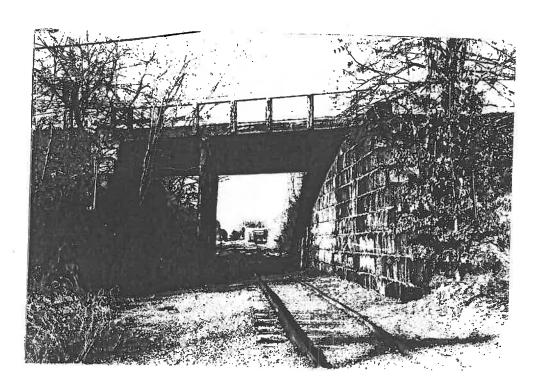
description: Wood stringer bridge carrying Exeter Road over RR, Hampton (46.59)
